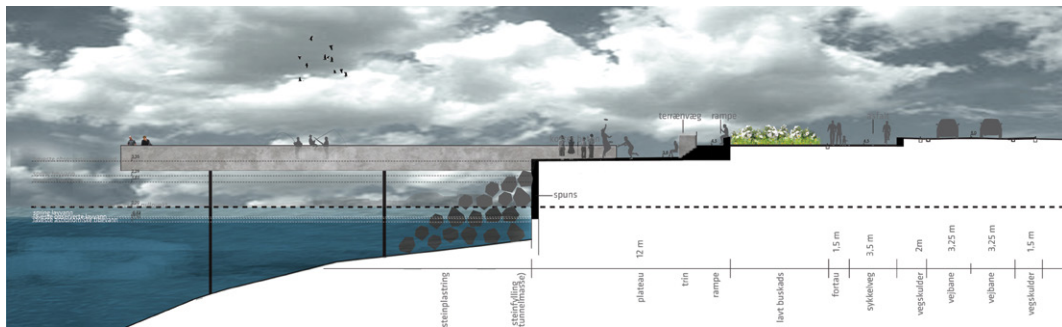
Section with view on the pier. Open and narrow, the pier stretches perpendicularly from the shore into the ocean. (Drawing by SLA, 2009)
